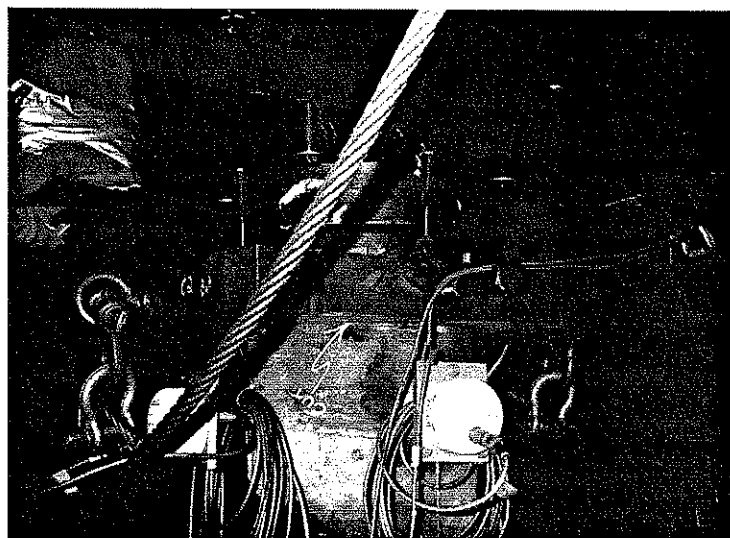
Bottom Spherical Bearing Fixture and Arrangement for Measuring End Rotation.
